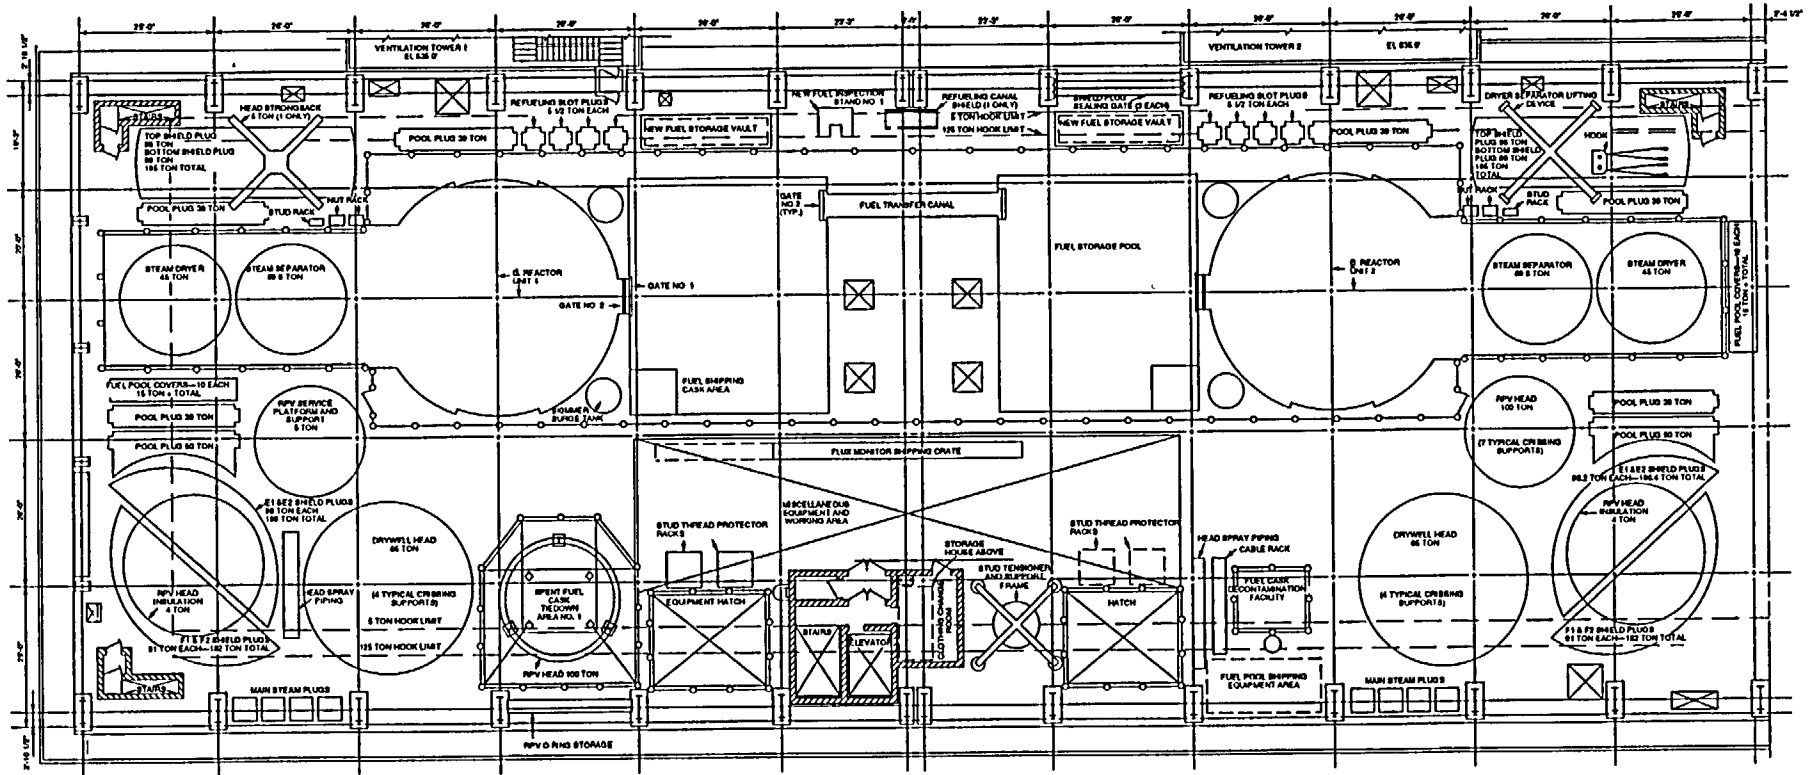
Typical Dual Unit Refueling Floor Arrangement
